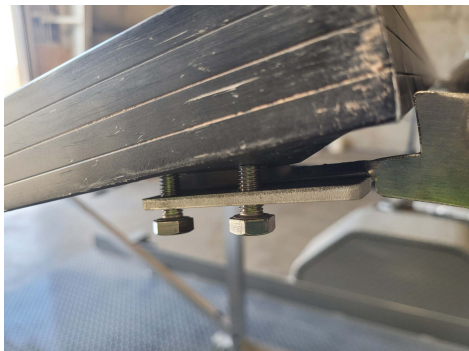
Underside solar panel at top ridgeline after 1500 lbf test load. Solar panel has started deforming at bolts and lifting off the attachment
